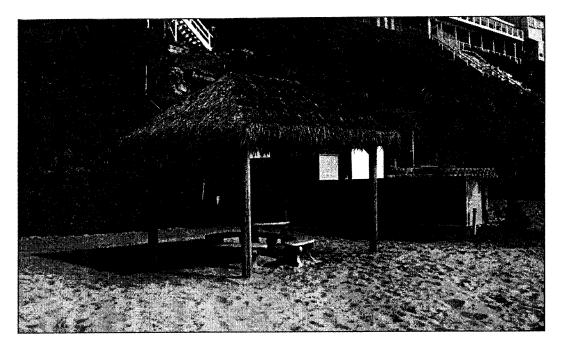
February 2004 photograph of unpermitted storage cabinets, concrete picnic table and benches, and shade/canopy structure on subject property. Vegetation has been removed from toe of bluff.
